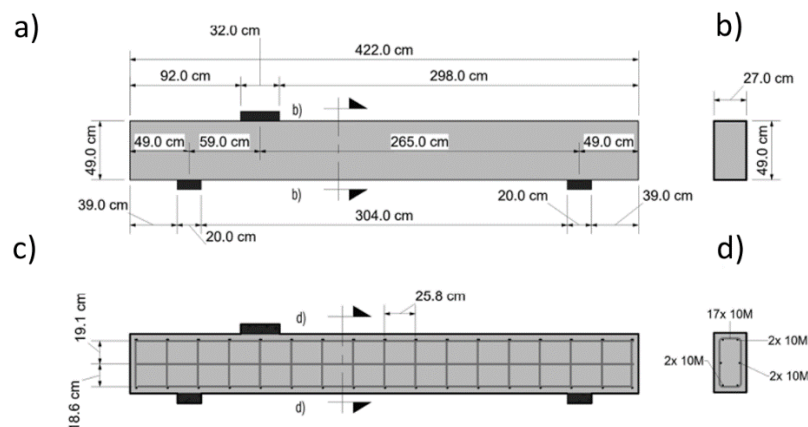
Studied deep beam: a) side view; b) cross-section; c) side view of the minimum distributed reinforcement detailing; and d) cross-section of the minimum distributed reinforcement detailing.
